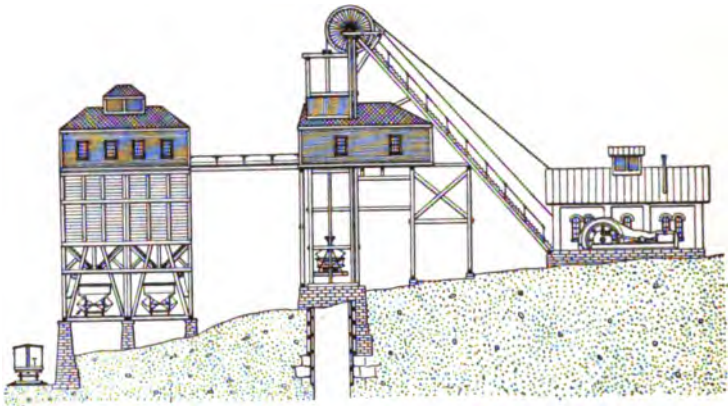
HEAD-HOUSE AND BINS, H. C. FRICK COAL COMPANY'S No. 3 COKE PLANT
